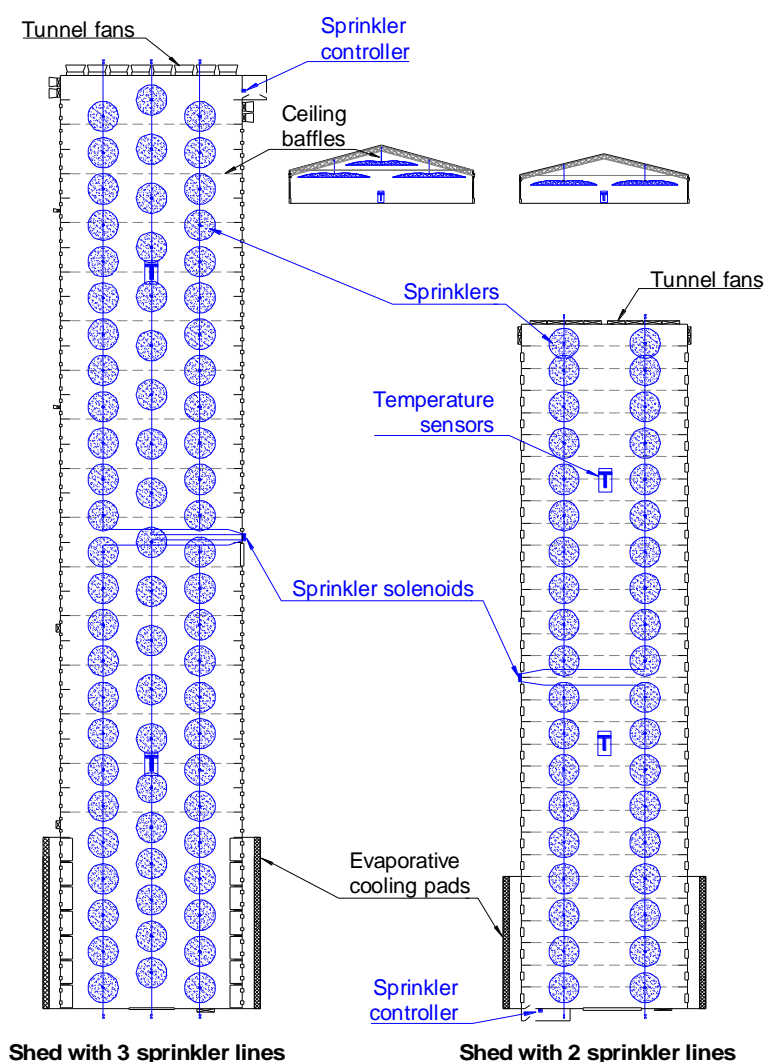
Schematic layout of a sprinkler system in a meat chicken shed
